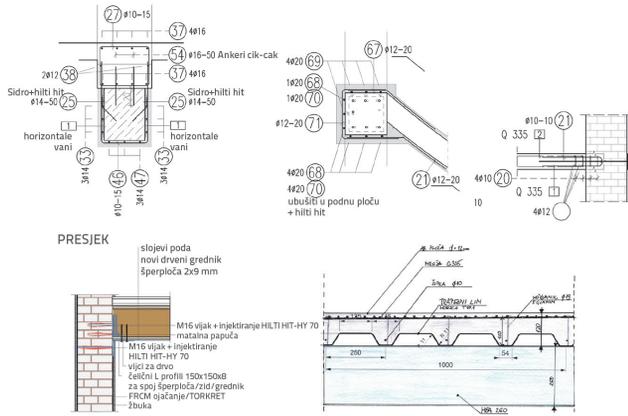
Characteristic details of the reinforcement of the existing ground floor structure [12]
